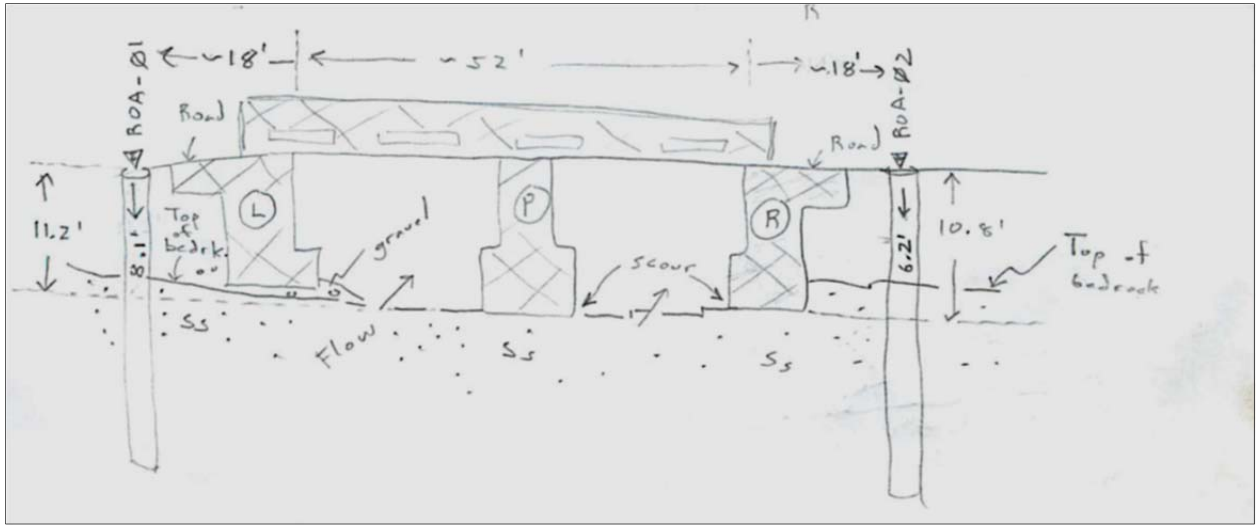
Field sketch of Roaring Creek Bridge, looking upstream.
